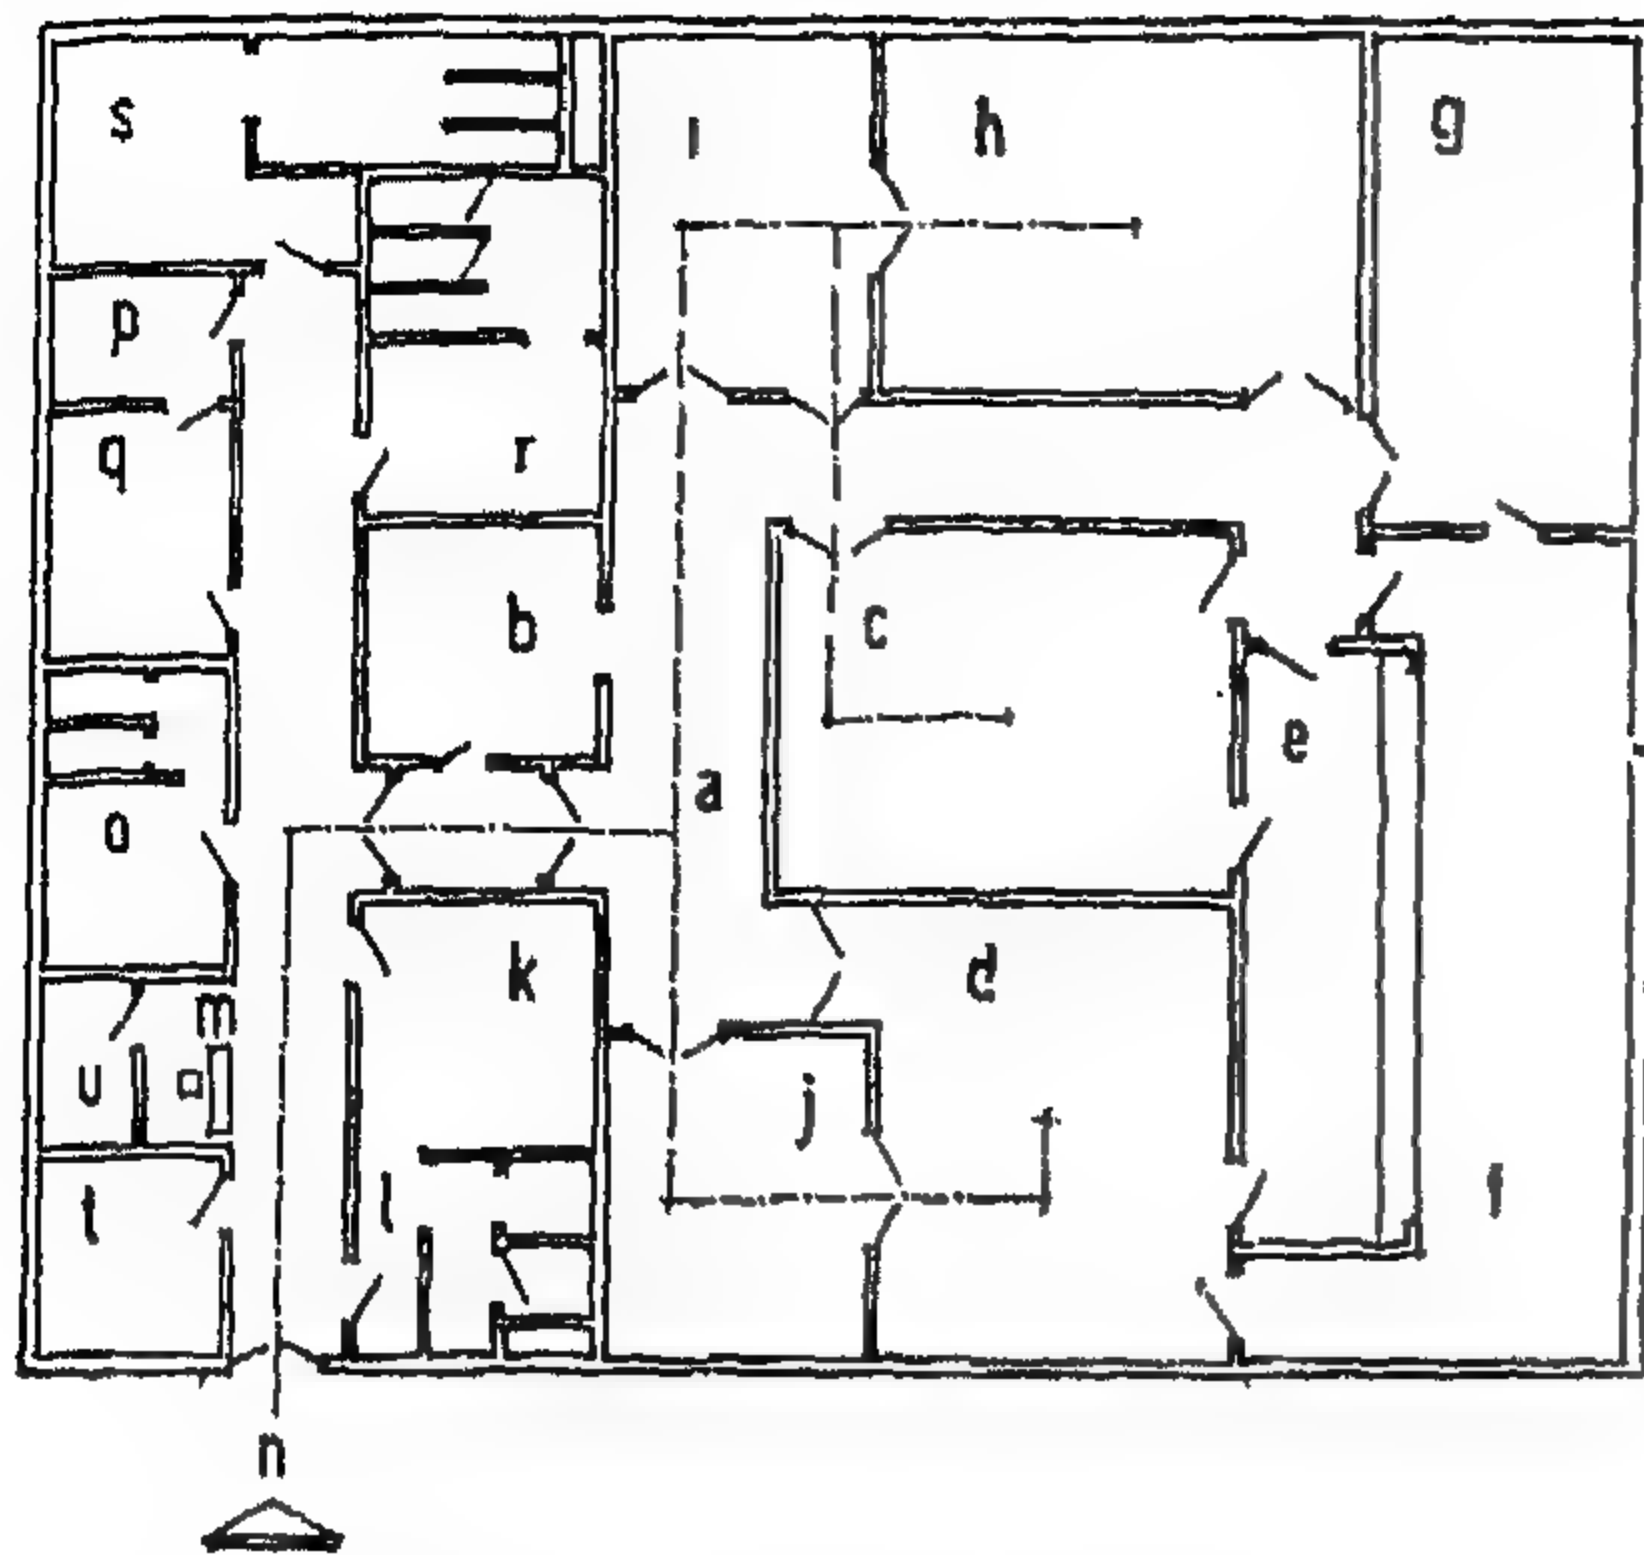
Possible practical plan of hospital operating suite developed from diagrammatic layout Fig. 7.
